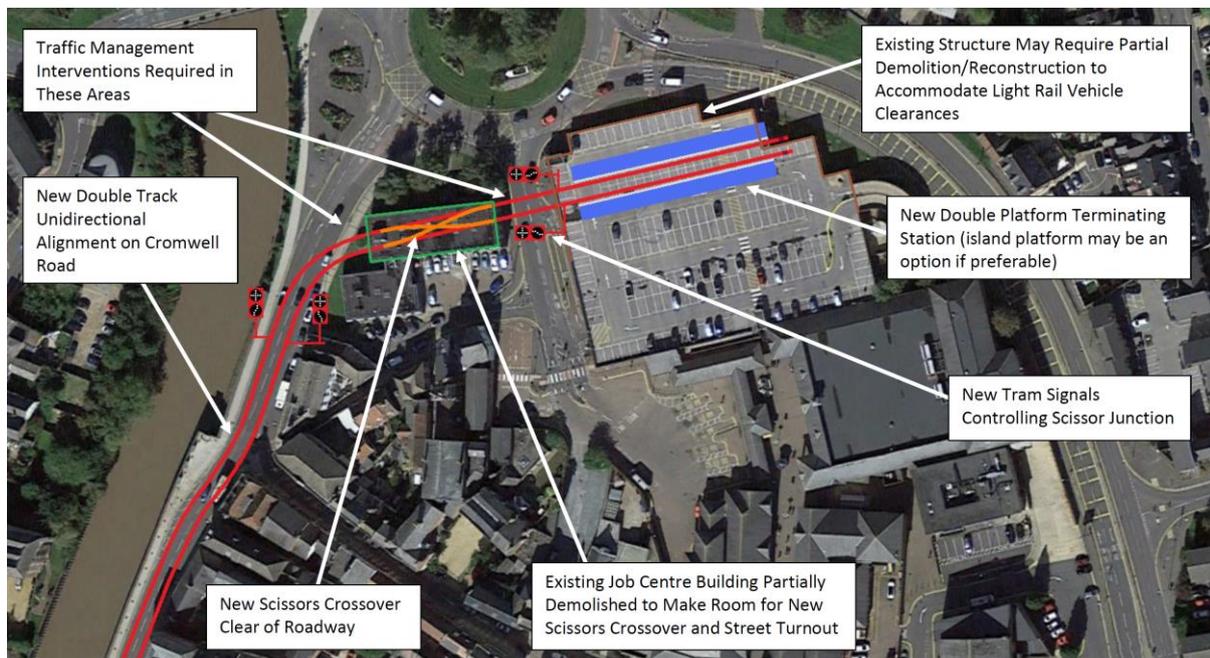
Proposed Horse Fair Interchange Town Centre Station
